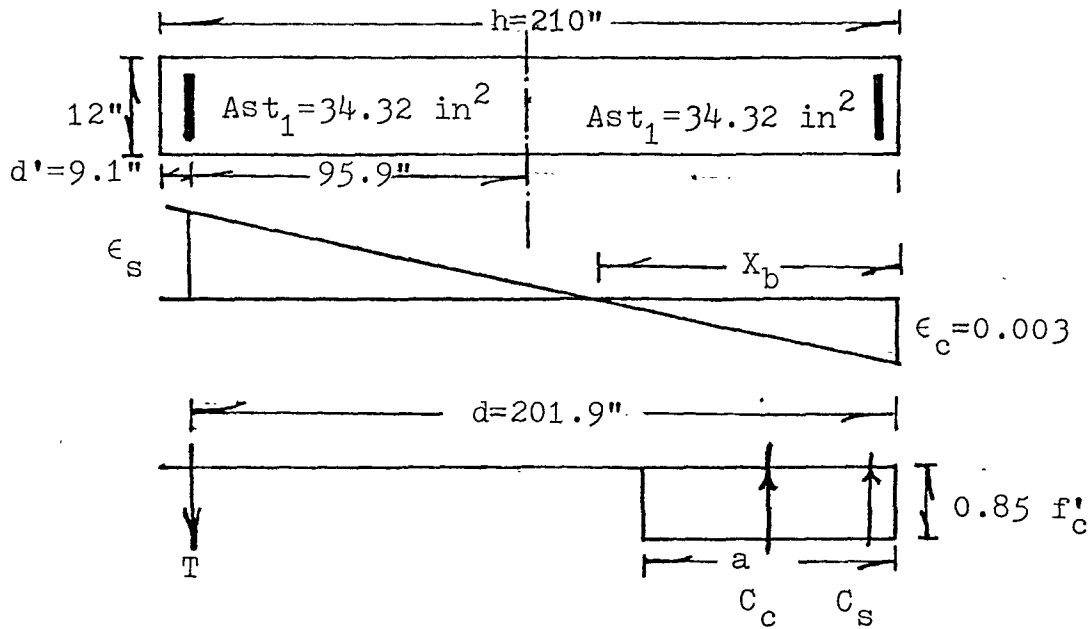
DIMENSIONS AND STRESS-STRAIN DISTRIBUTION AT THE PIER OF EXTERIOR WALL
